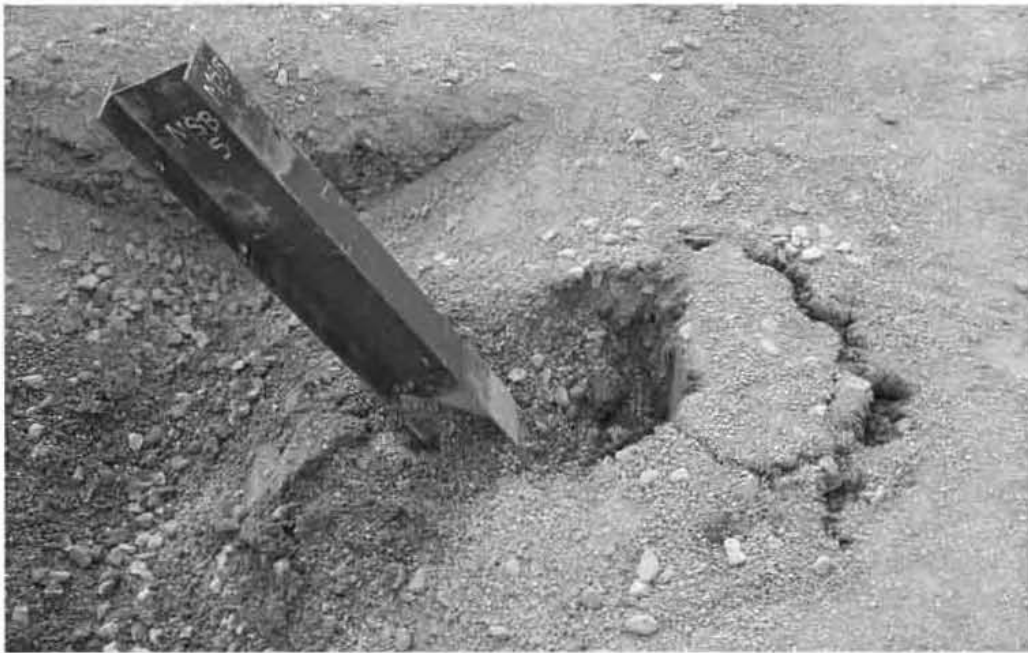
Post Damage and Soil Failure, Bogie Test MSB-5
